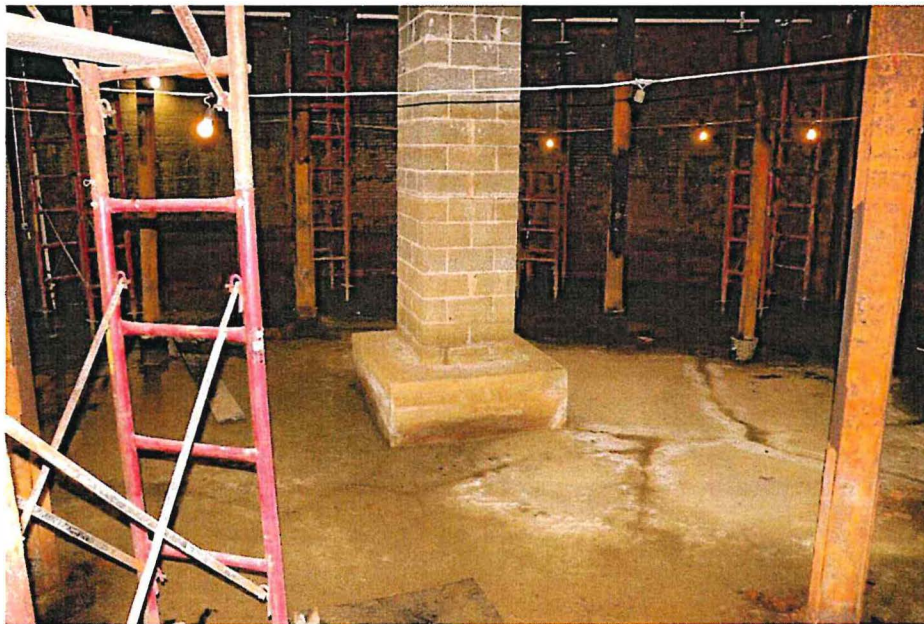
Basement Floor with Cracks and Wet Areas
